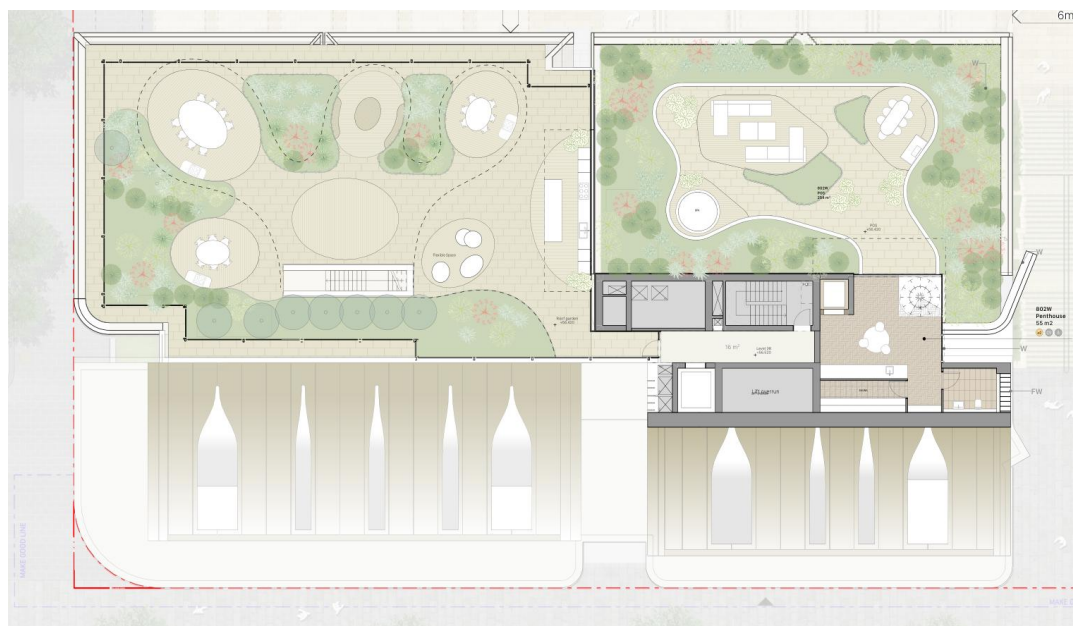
General Arrangement Plan – Level 9 – William Street West Building
